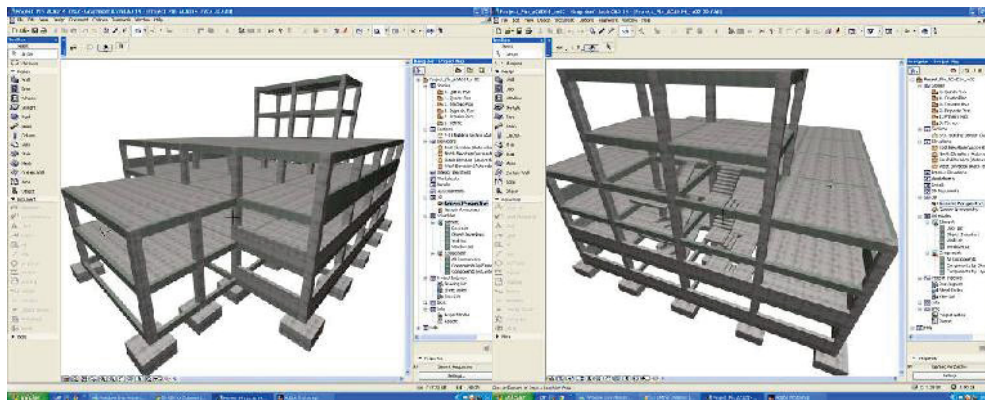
ArchiCAD 14 – Reinforced Concrete Structural Model
